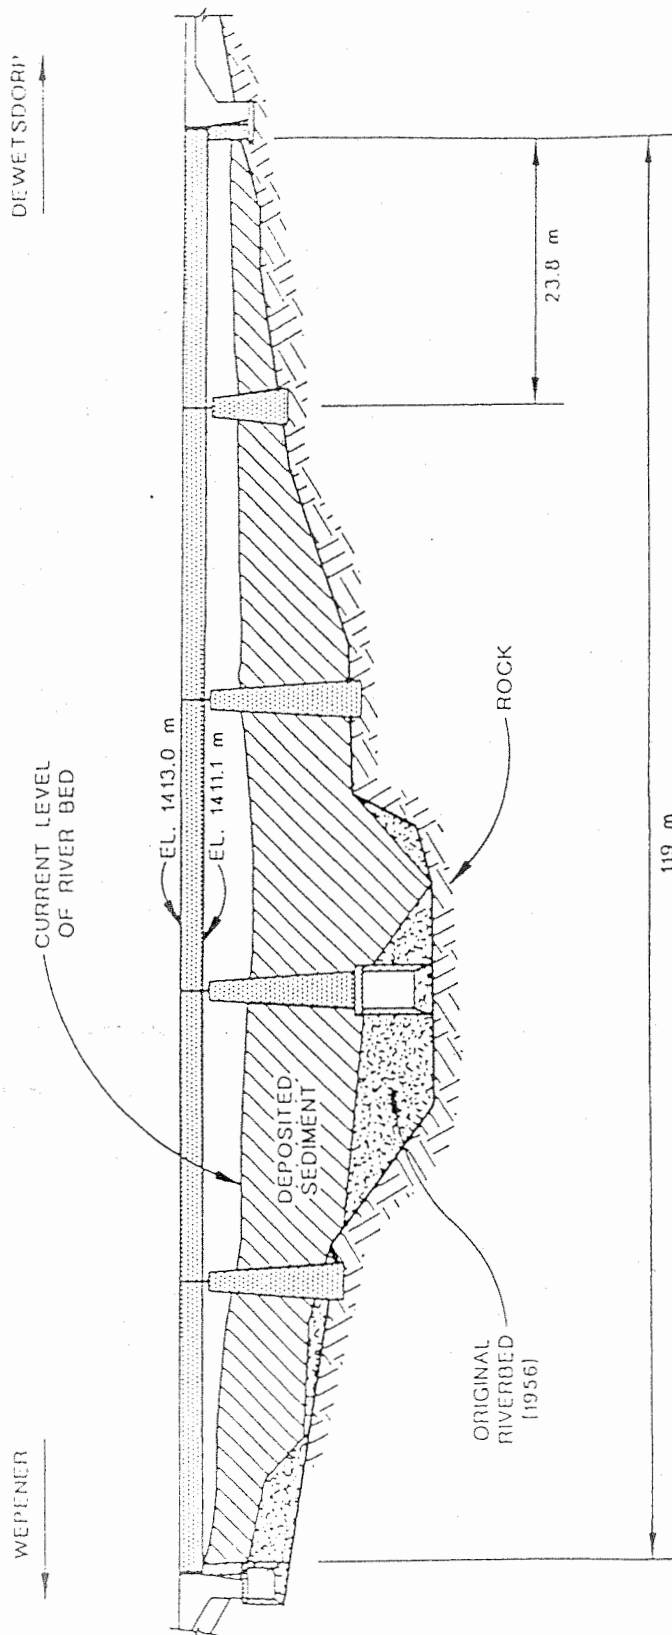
JIM FOUCHE BRIDGE OVER CALEDON RIVER
